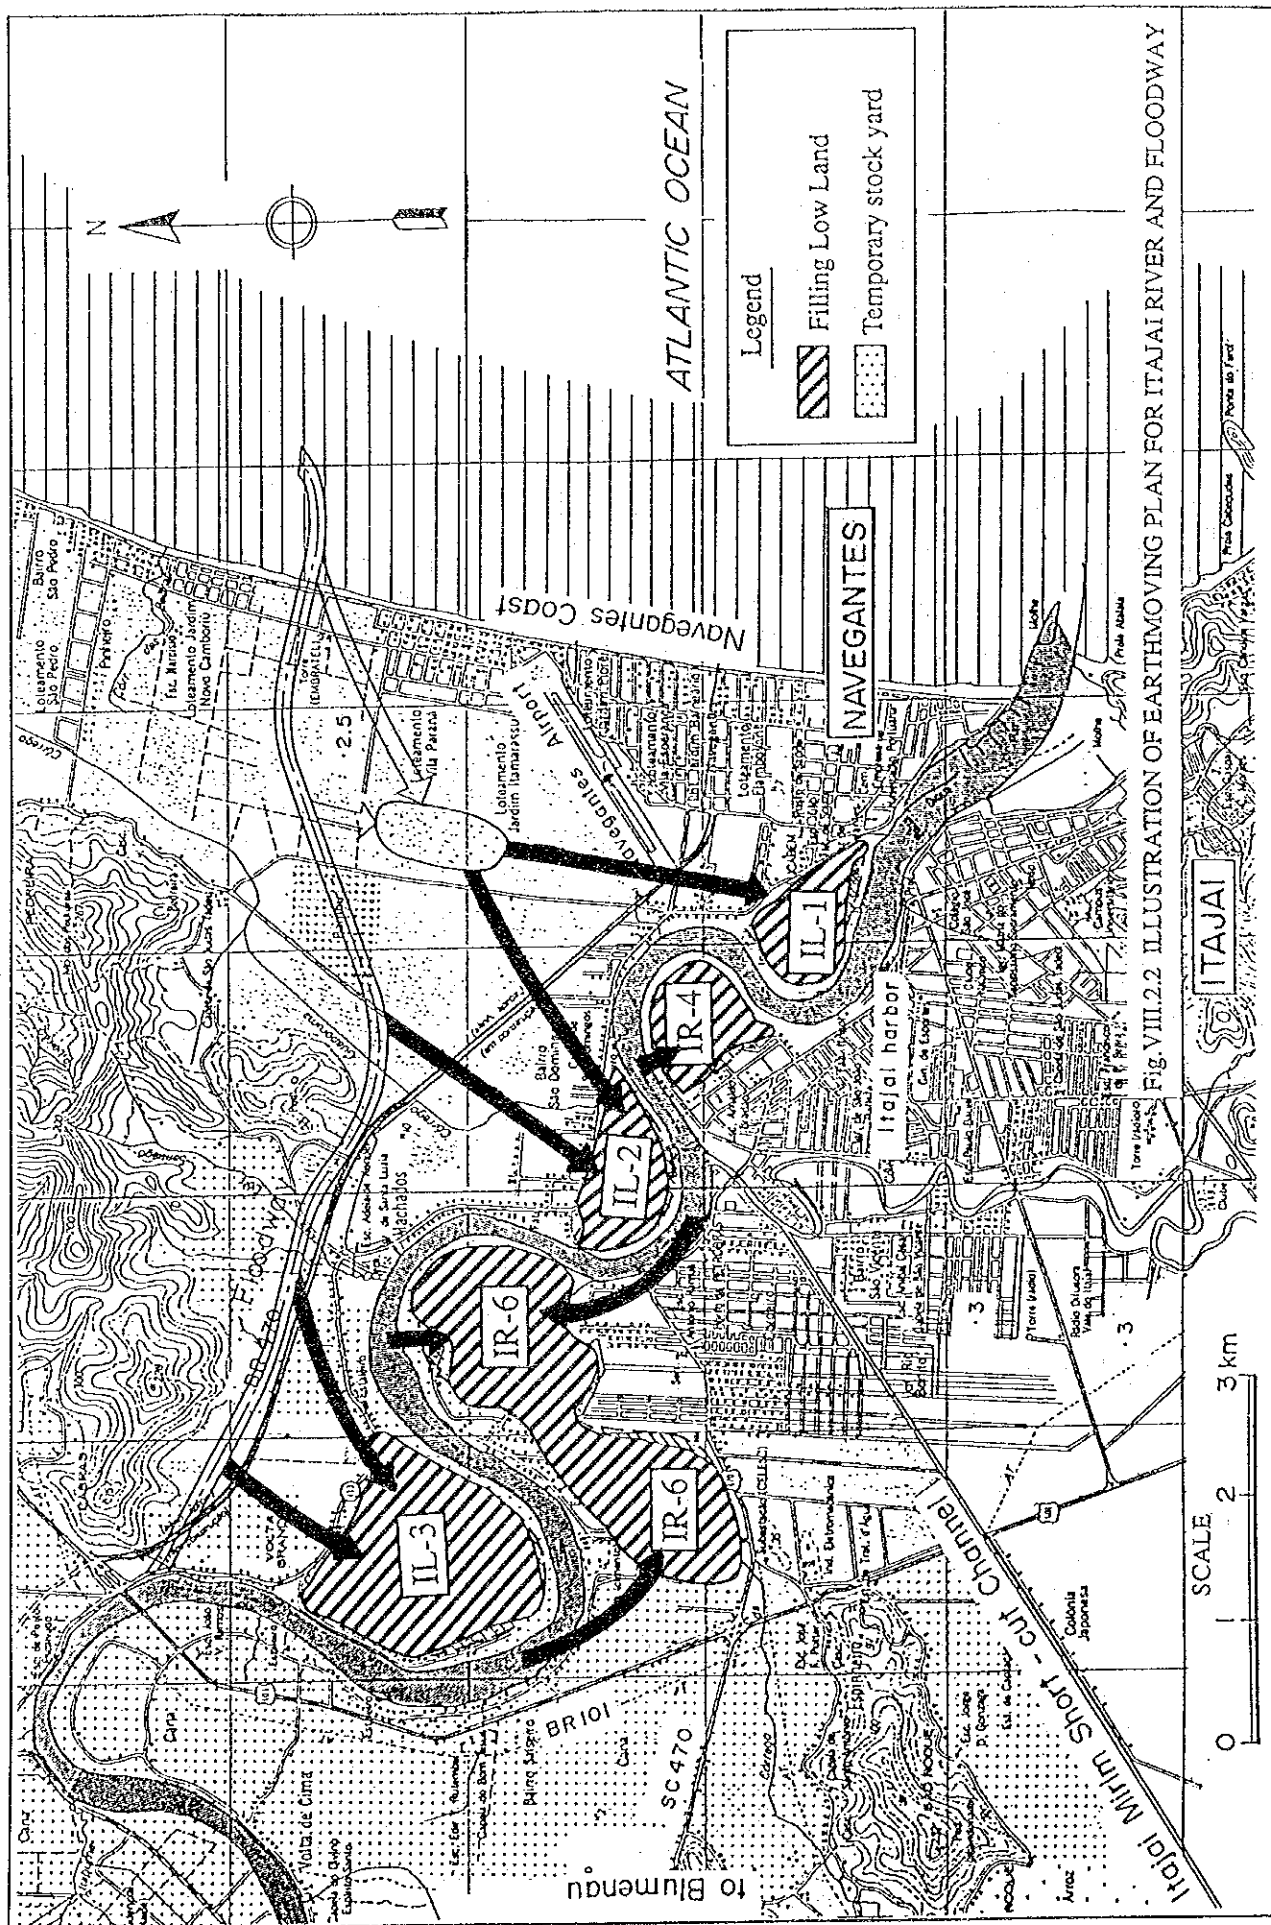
ILLUSTRATION OF EARTHMOVING PLAN FOR ITAJAÍ RIVER AND FLOODWAY
